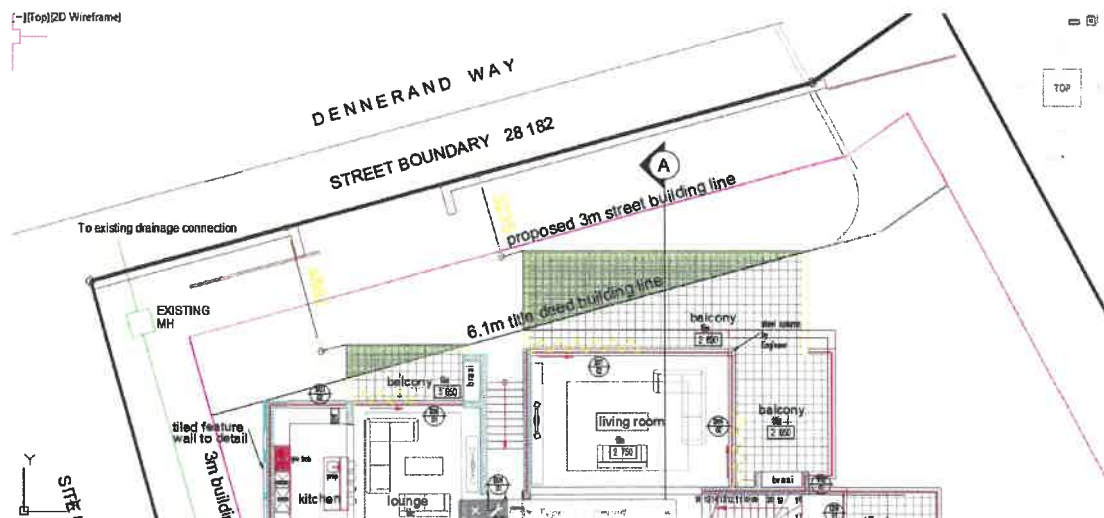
Proposed street building line encroachment: Lower Ground Floor
